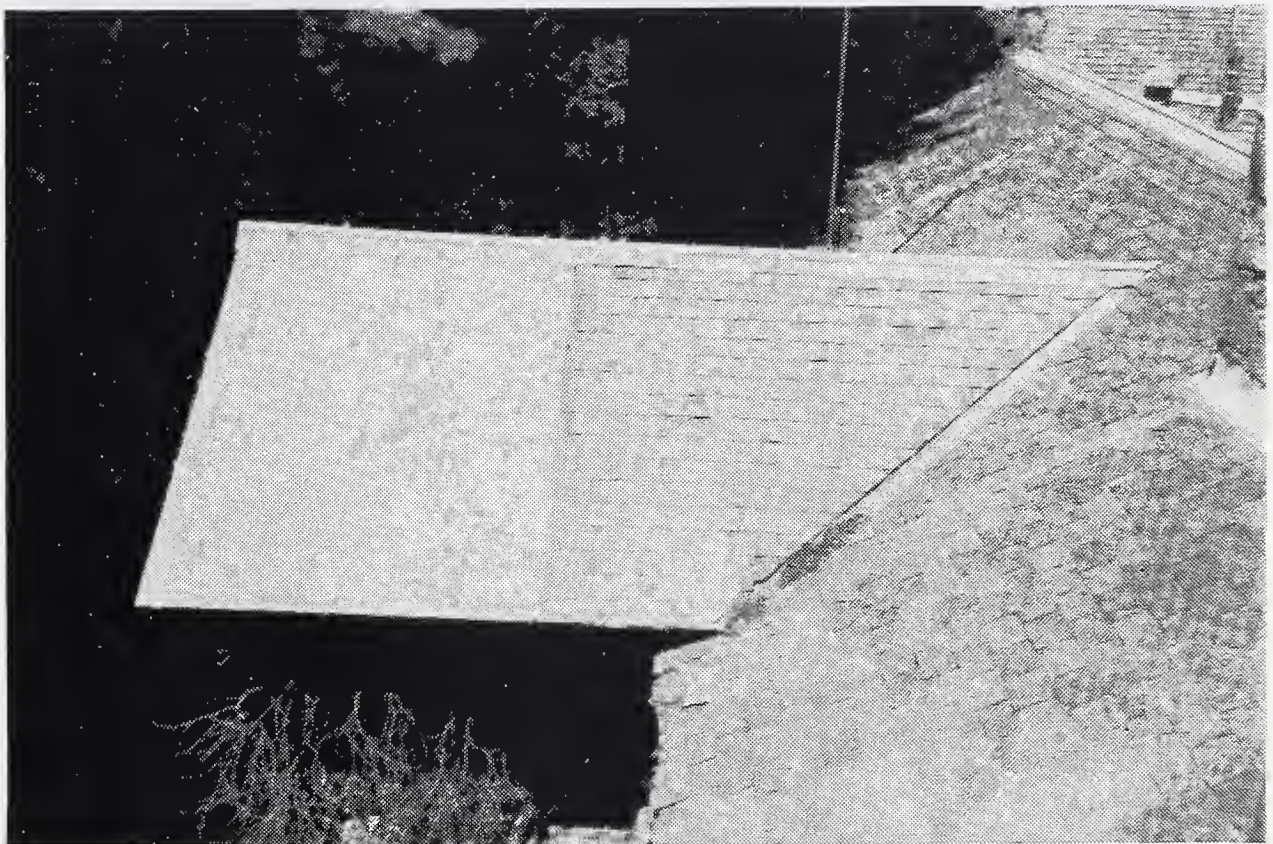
Asphalt Shingles on Left. Note Chipped and Cracked Slate.
